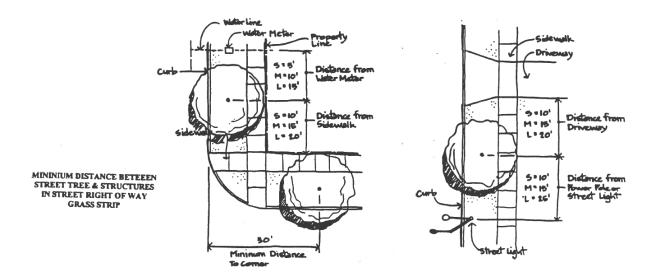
Minimum distance between street trees and structures in street ROW grass strip
